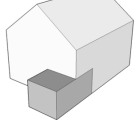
Junction to unheated stairwell – treat as party floor (E6 or E7)
